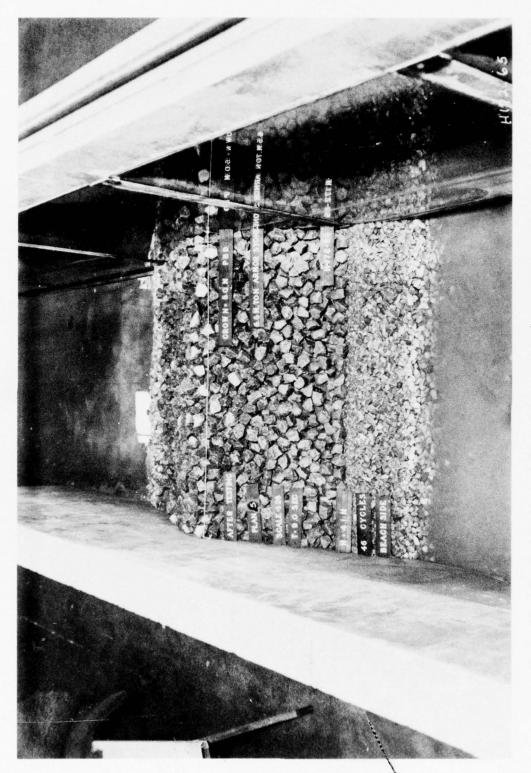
Beachside view of Plan 5 in the deeper water location after attack of 9-sec, 4.1-m waves at a swl of +1.50-m PBD
